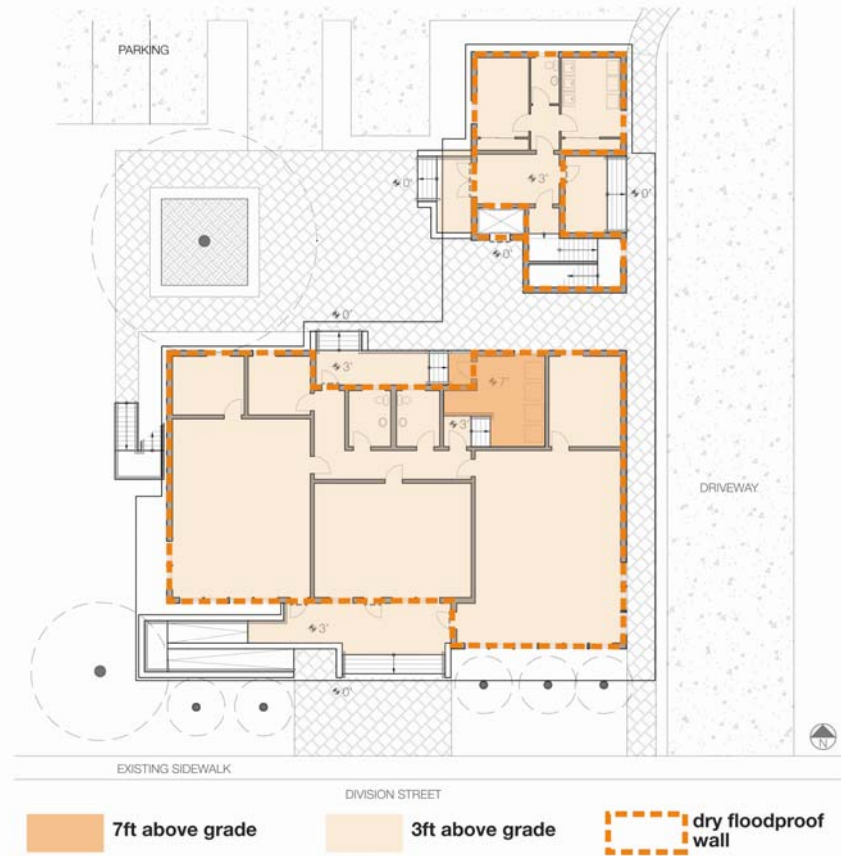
DIAGRAM: Dry floodproof construction, first floor, sample building.
